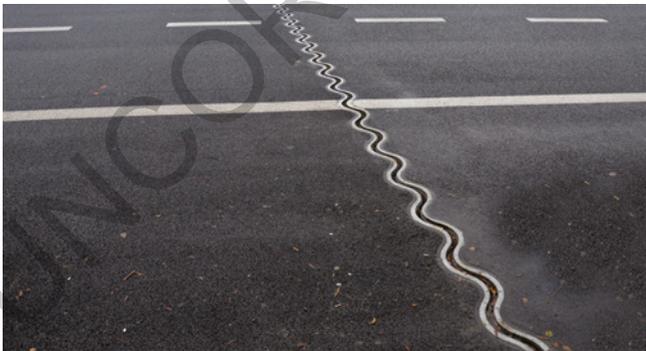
Expansion joint joining two sections of road on a bridge
